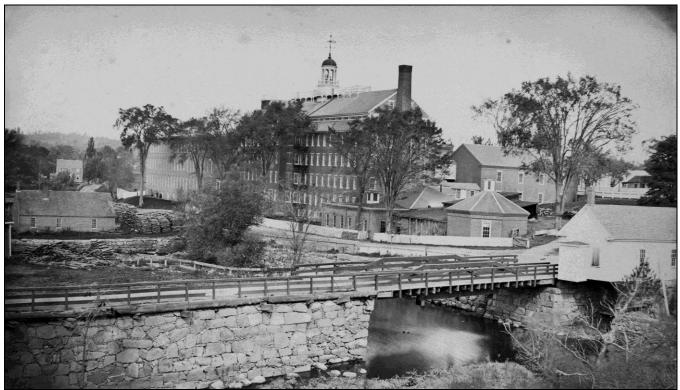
Photo of String Bridge, before 1888 reconstruction, upstream side and east channel. Note: east span consists of wood pony truss of the Warren type; stone retaining walls supporting island, portions of which survive today; octagonal brick Waste House of the Exeter Manufacturing Co., in background (Exeter Historical Society).
